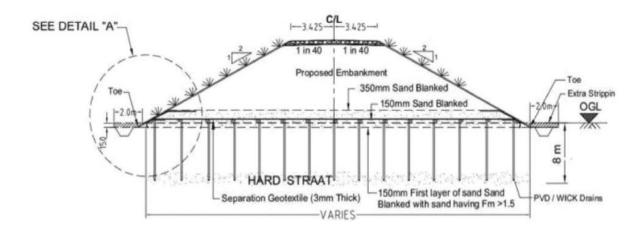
Sectional elevation of the embankment on soft soil improved by installing PVD''s (Ripon 2020)
